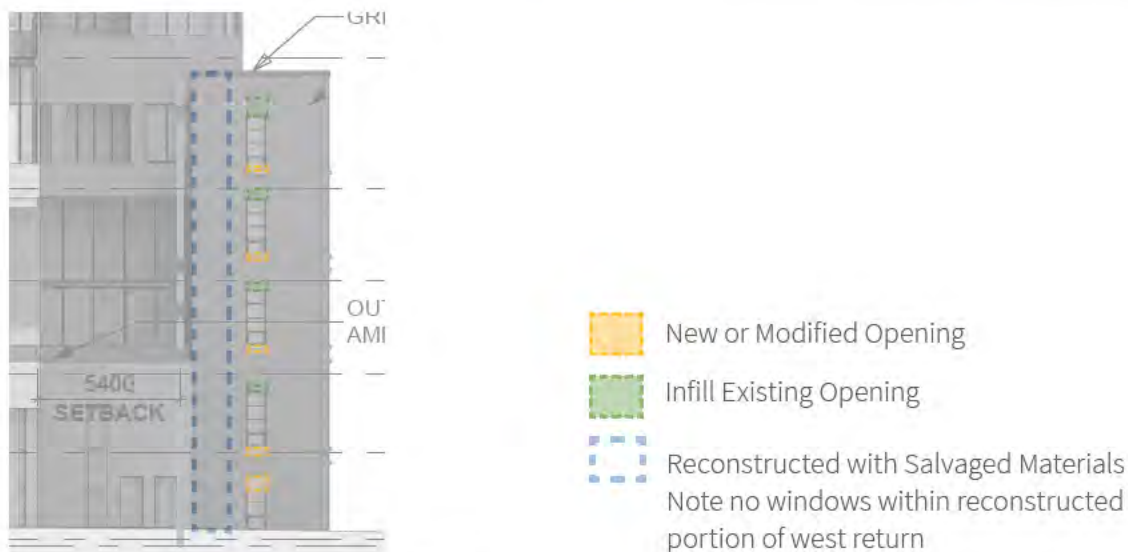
Proposed west elevation (Wallman Architects, 2024; annotated by ERA).
